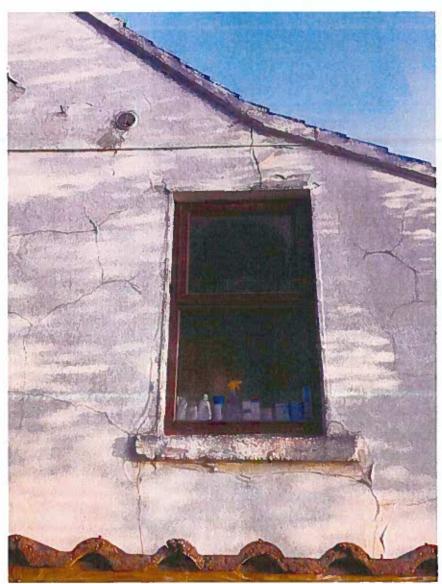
Hairline Cracking throughout walls and Structural Crack over Window
